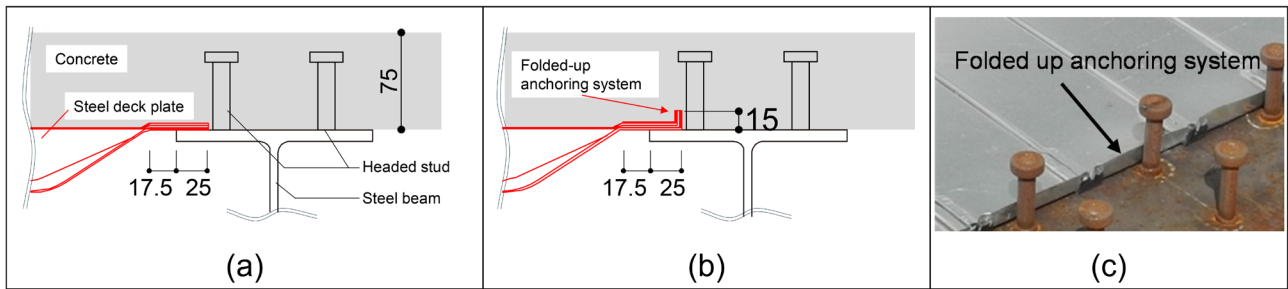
| Ends of deck plate model: (a) Without anchoring system, (b) with anchoring system, (c) photograph of anchoring portion (mm).
